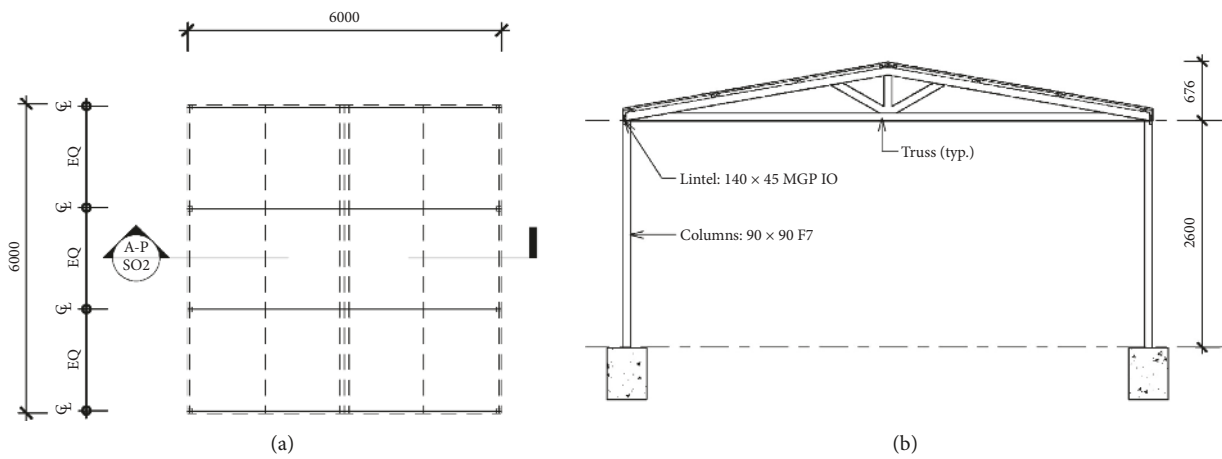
Truss system Case A. (a) Layout. (b) Cross section.
